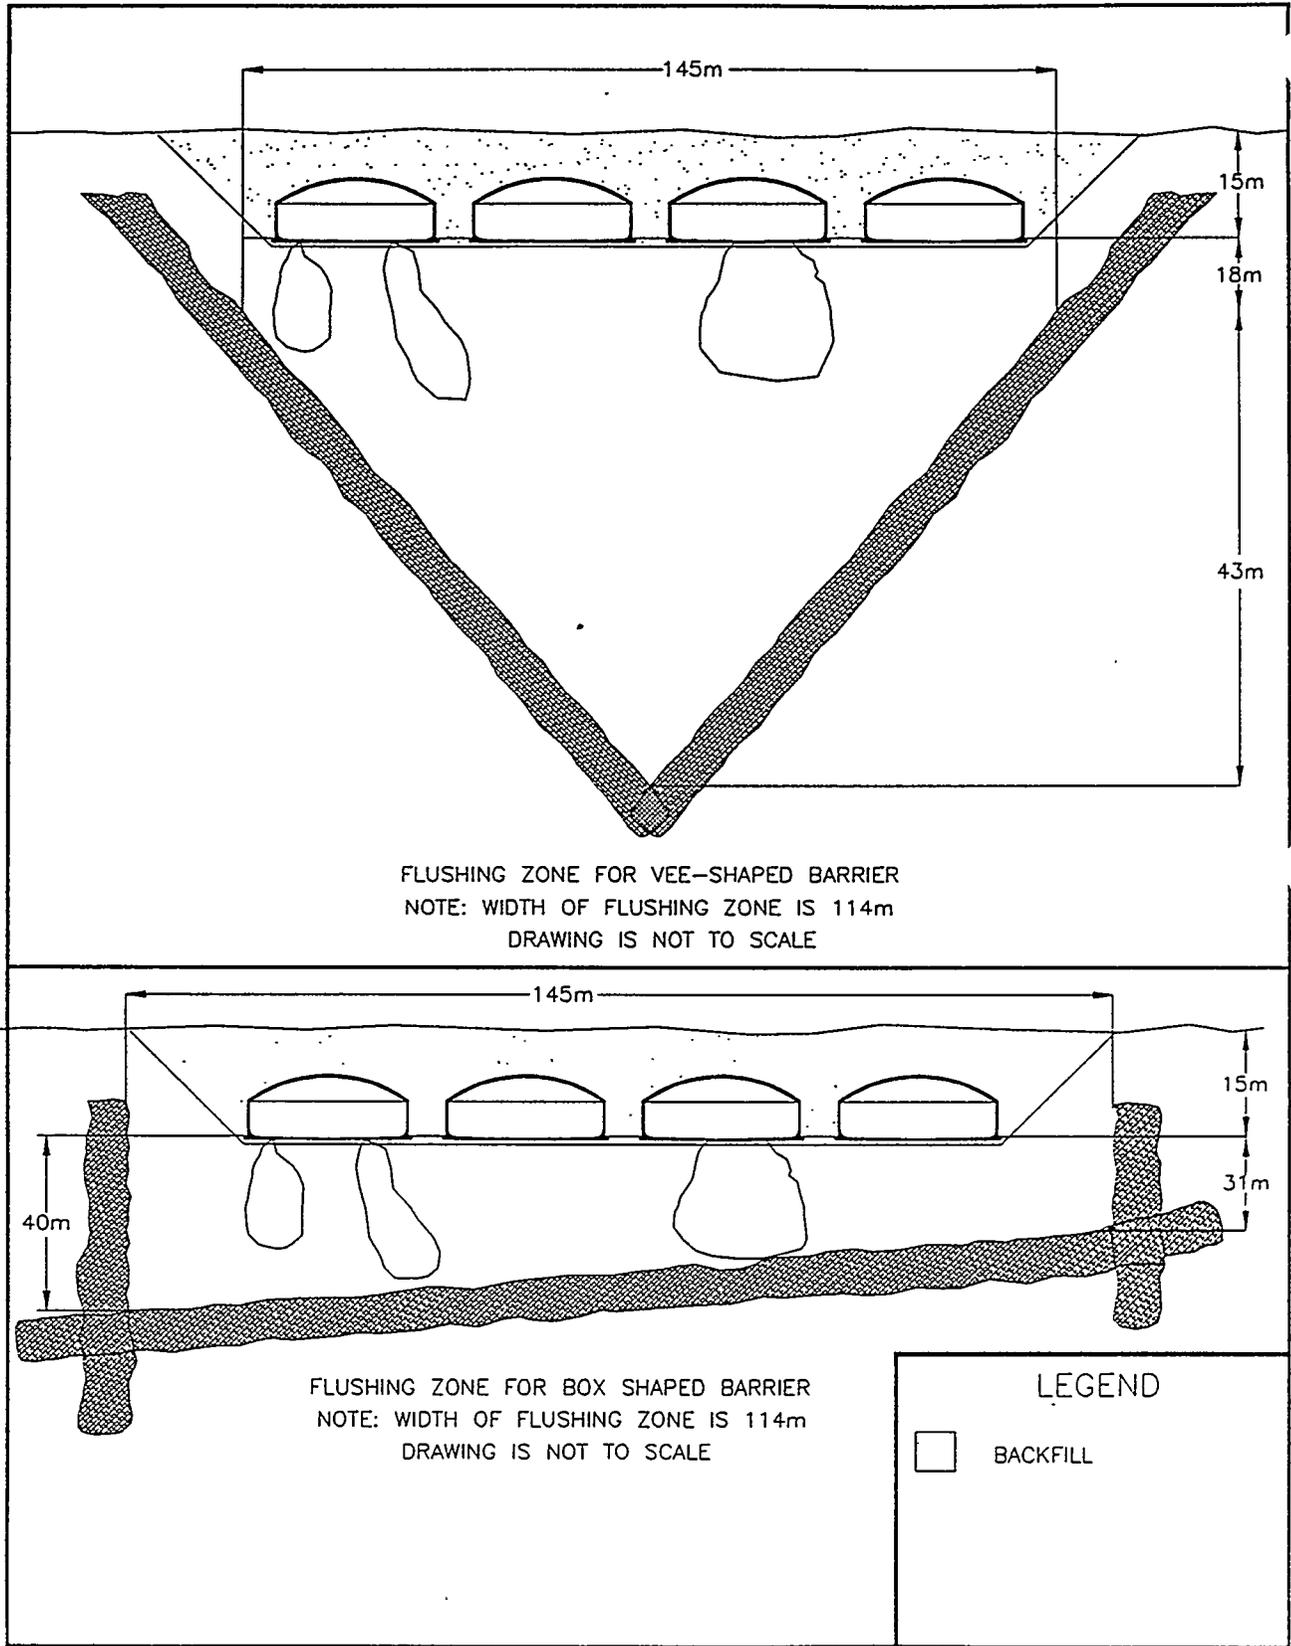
Cross-Sectional View of In Situ Flushing Zones for V-Shaped and Box-Shaped Barriers.
